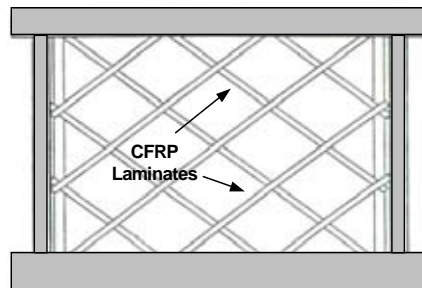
Strengthened wall (Schwegler, 1995)
